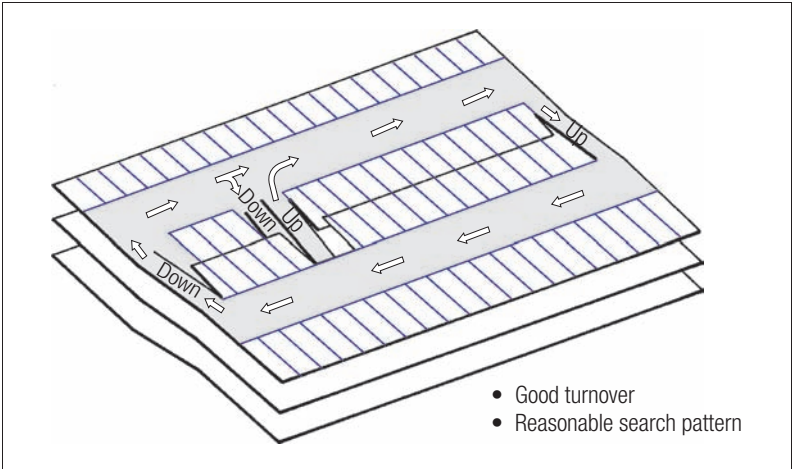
Split-level car park with separate entry and exit circulation and with short down (exit) ramp system
